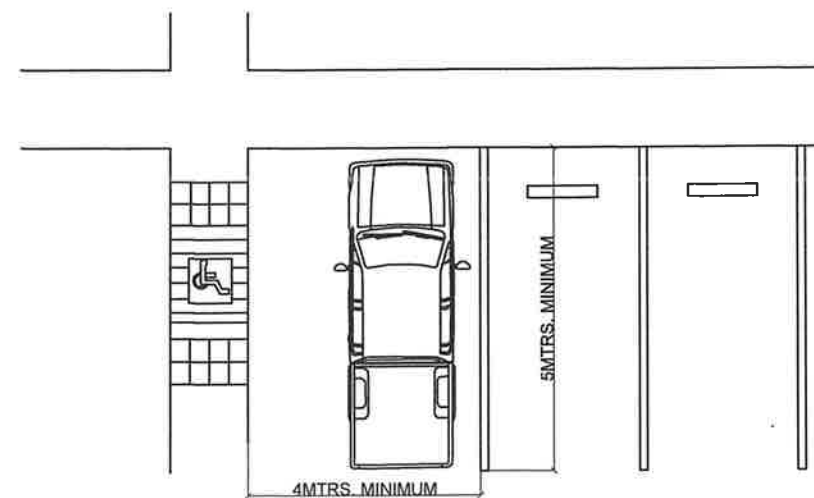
PLAN OF ACCESSIBLE PARKING SLOT
